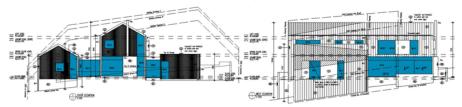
South (rear) and west elevations (Preston Lane, 2021)
